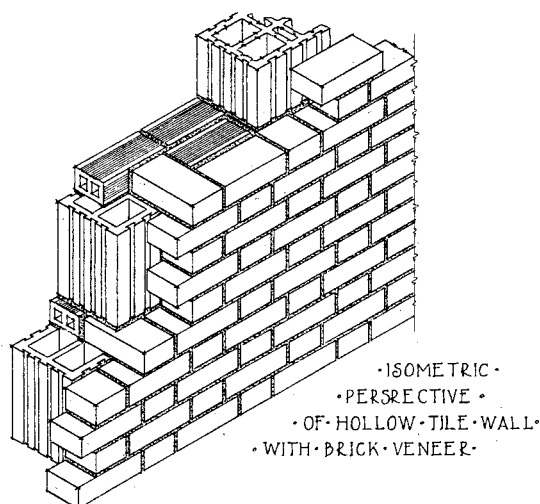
Bricks integrated into the tile units (from National Fire Proofing Co., Builders Handbook of Natco Hollow Tile Construction, 19).
